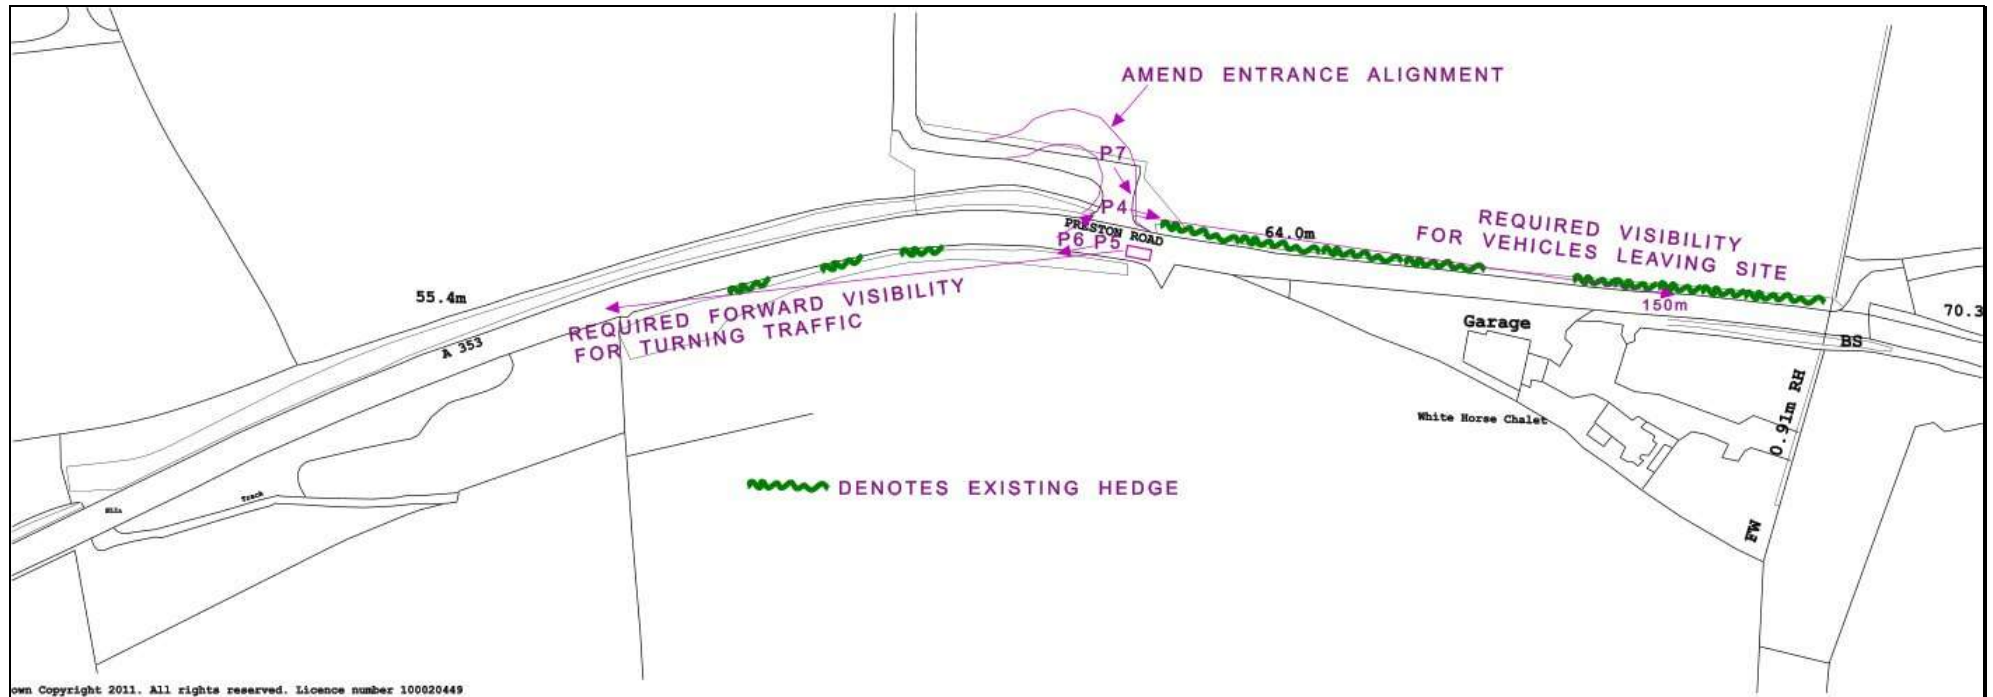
Road plan for access from A353 to campsite, showing visibility requirements
